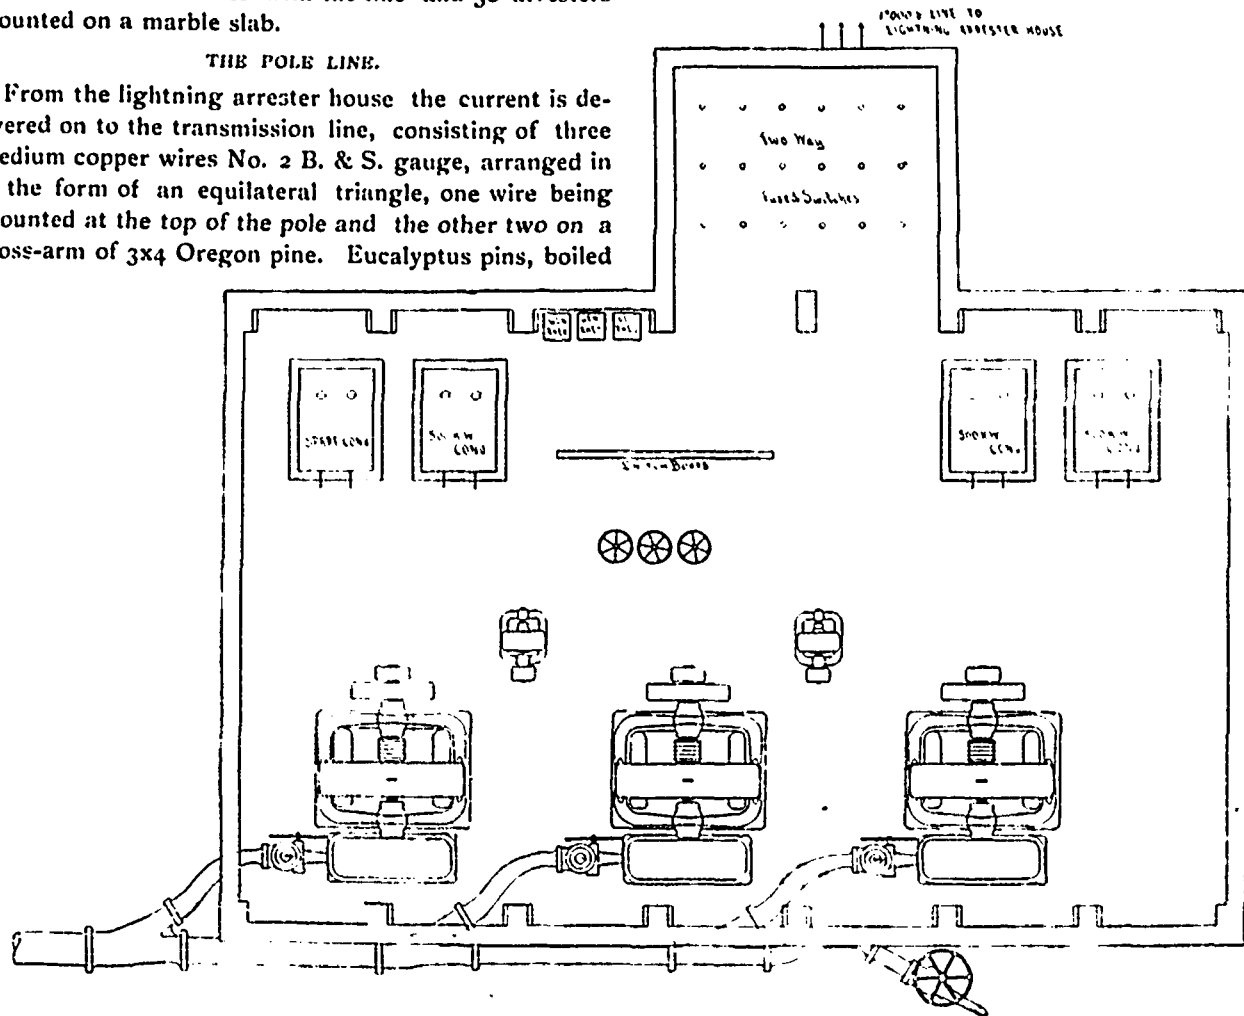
GROUND PLAN OF MOUNT WHITNEY POWER HOUSE.
